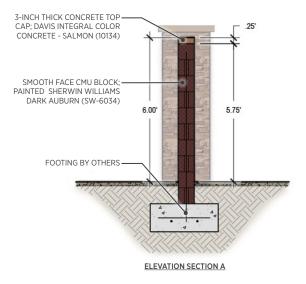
| WALLS & MONUMENTATION PLAN
